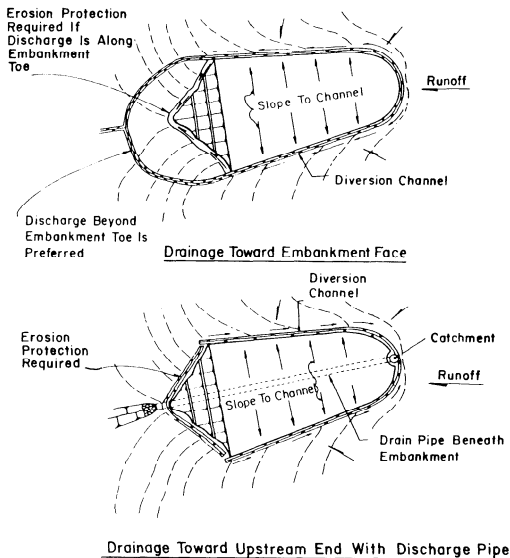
Typical final drainage pattern, valley fill disposal site (Anon., 1973).
